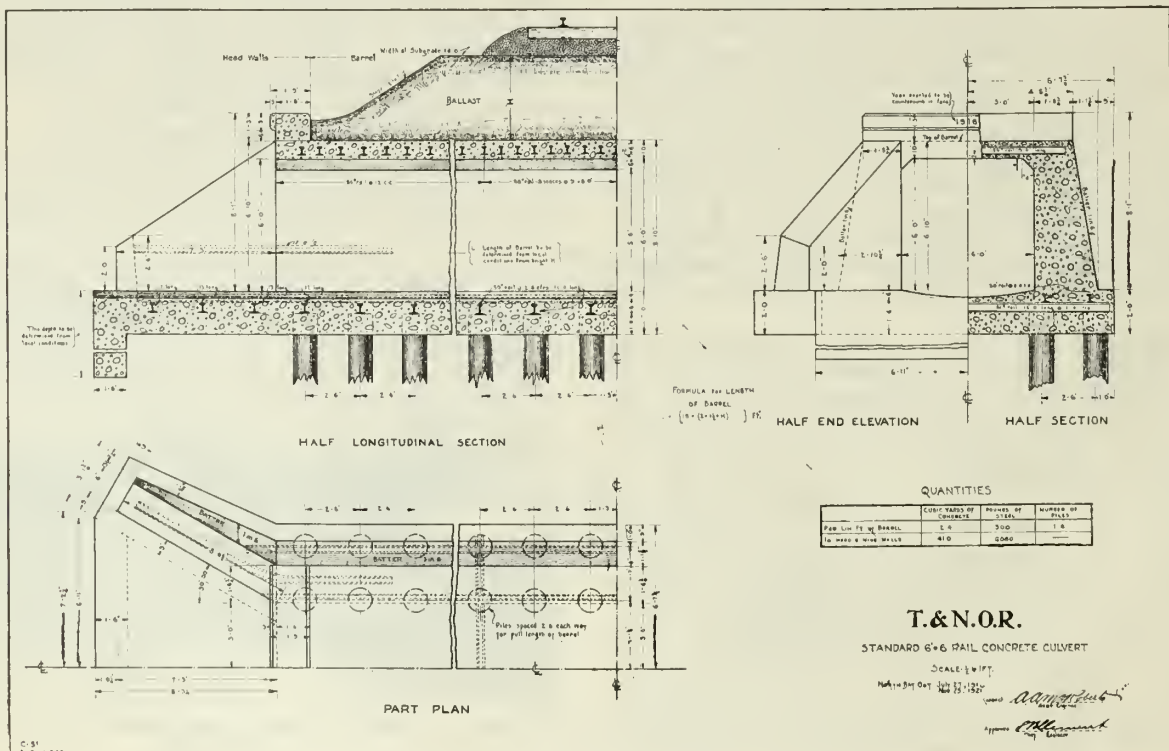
Standard 6-foot by 6-foot Rail Concrete Culvert, T. & N.O. Ry.
